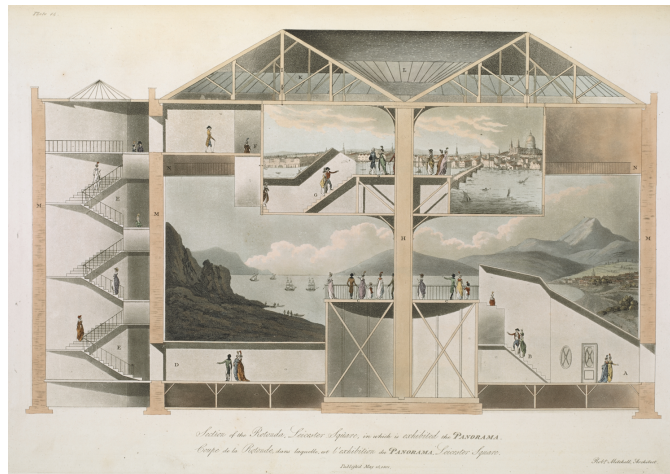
Cross-Section view of the building and paintings created by Robert Barker in 1773 and later patented by him in 1796. The Cross-Section shows a painting on a round wall stretching up for multiple floors as well as stairs leading to various sections of the building with different panoramic paintings simulating a change in the view.
